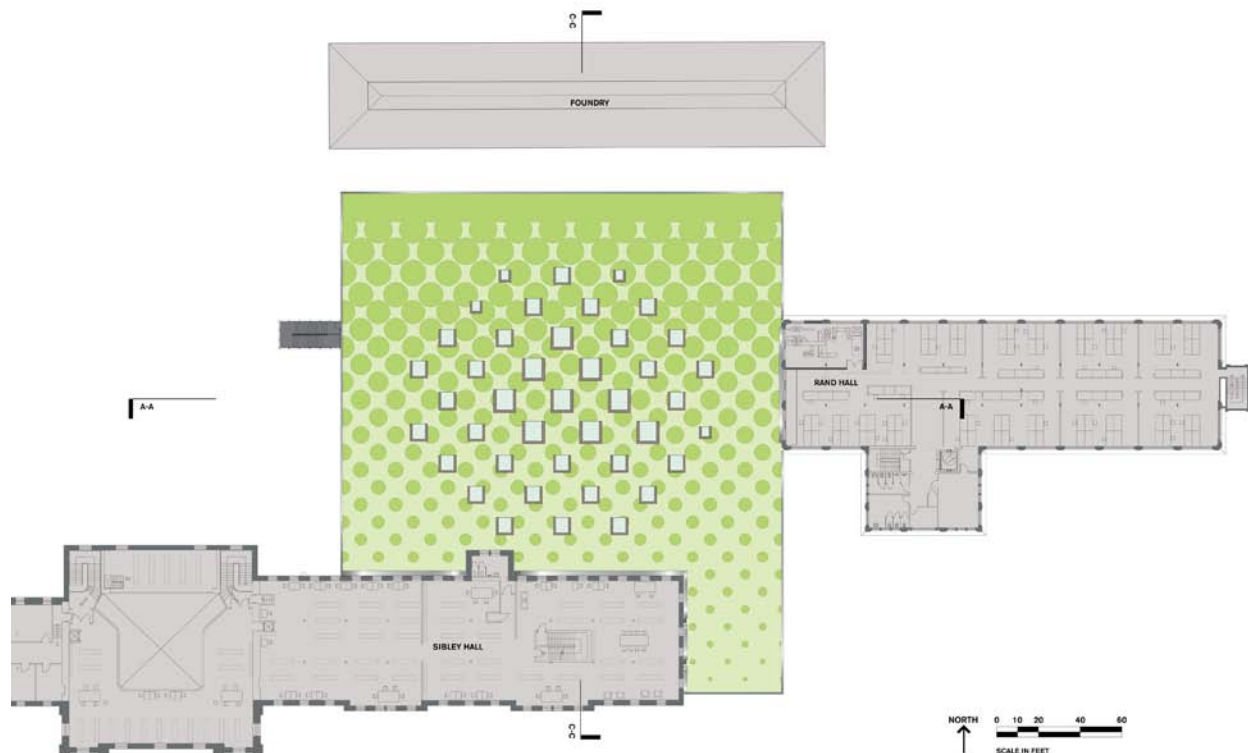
Plan view of Milstein Hall's green roof.
